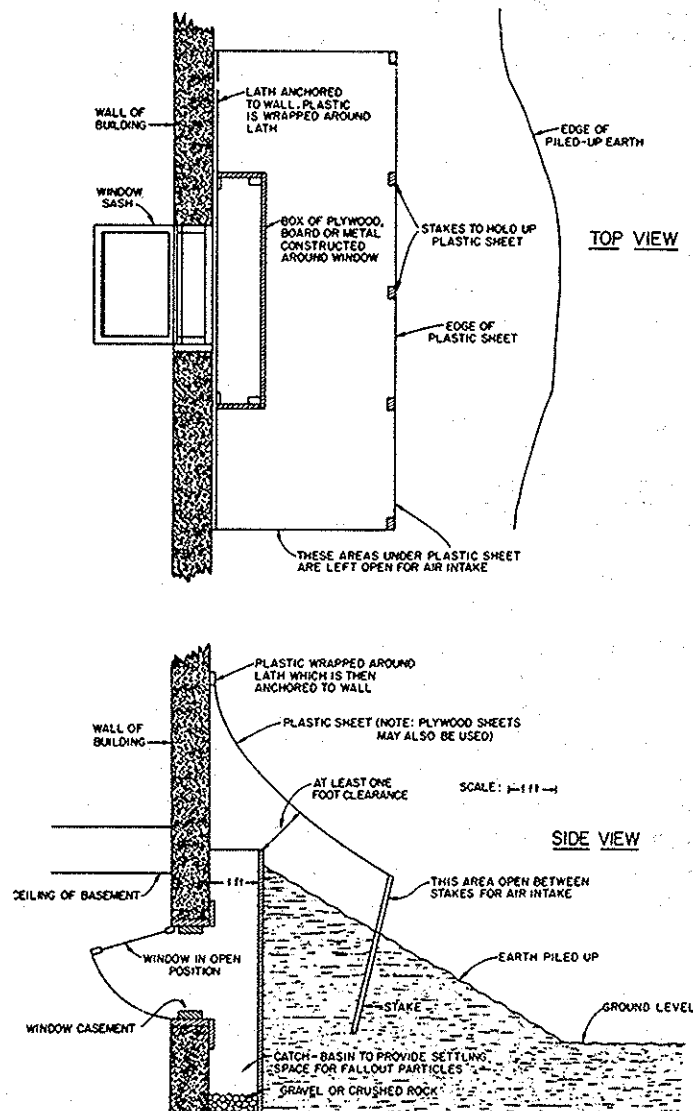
A way to construct a baffle over a basement window to allow air to flow in while reducing gamma penetration and preventing fallout from entering.
